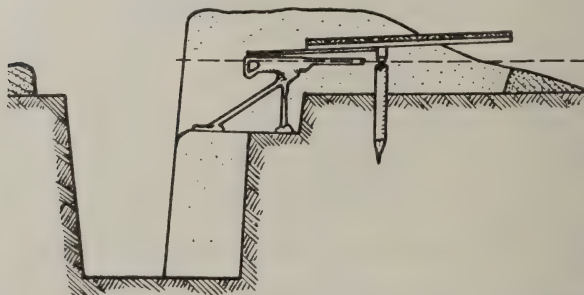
Profile showing head cover raised, machine gun ready to fire.
